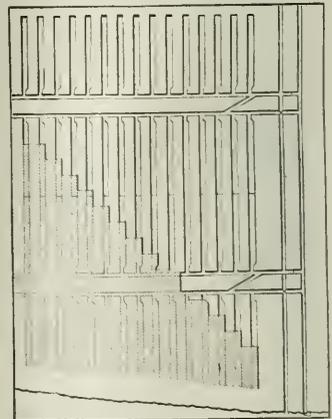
WITH GRADES FAVORING. THIS PLAN PREVAILED
